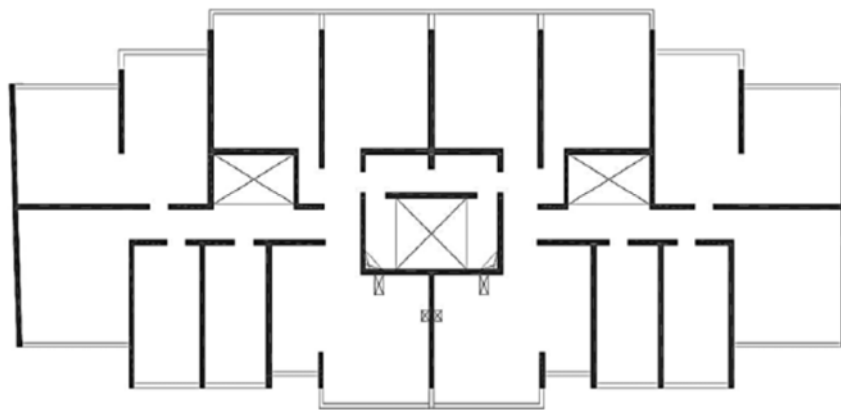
Typical building plans in high rise construction (common in Chile (NIST GCR 12-917-18))
